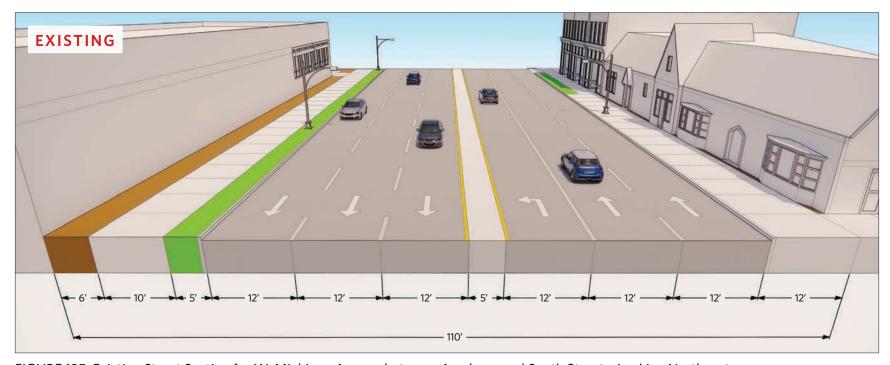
Existing Street Section for W. Michigan Avenue between Academy and South Streets, Looking Northeast
